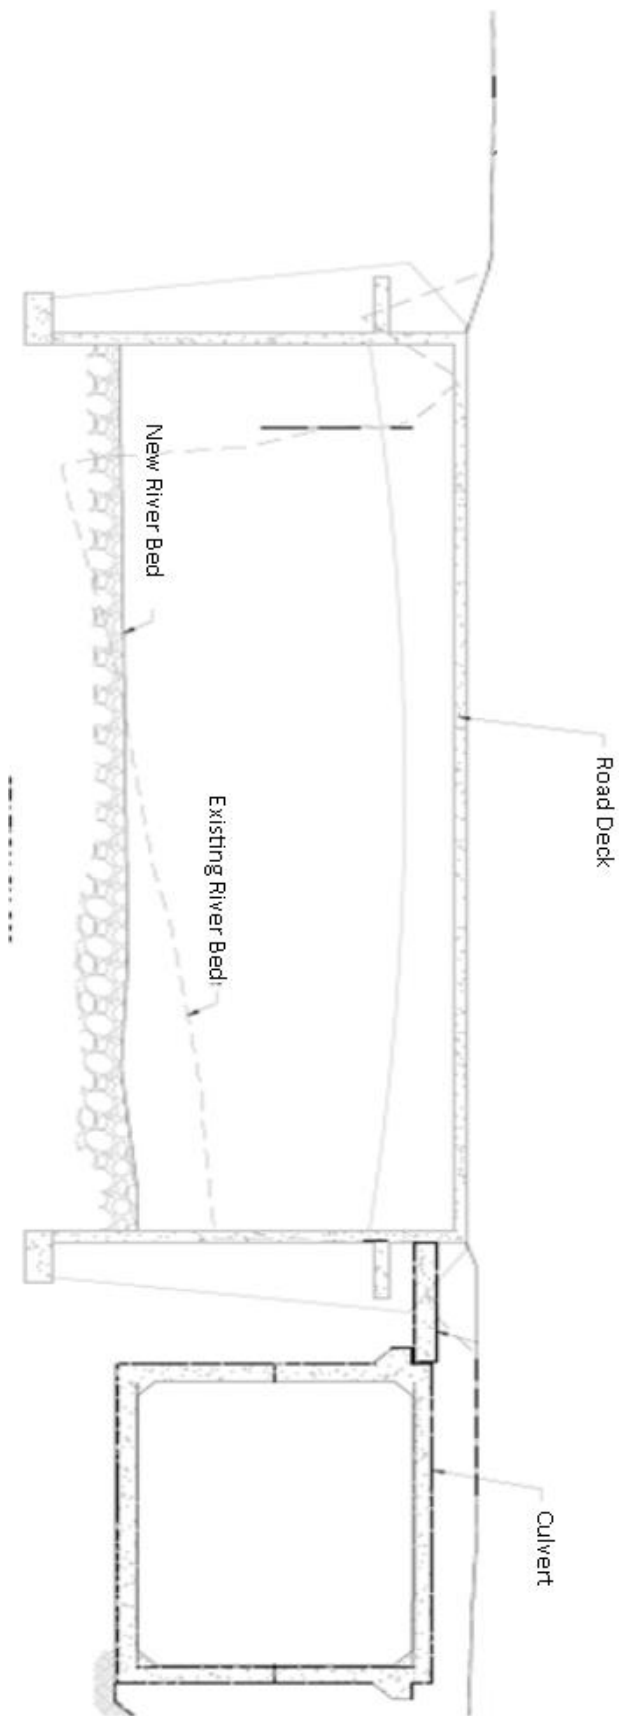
Typical Elevation View of the Additional Culvert adjacent to the Existing Bridge
